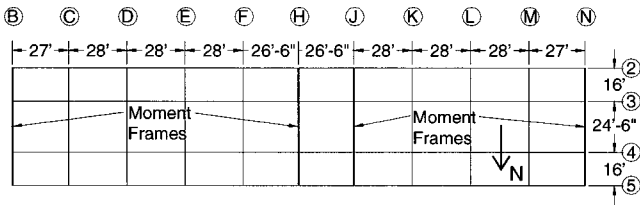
Demonstration hospital floor plan (Adapted from Yang and Whittaker 2002)
